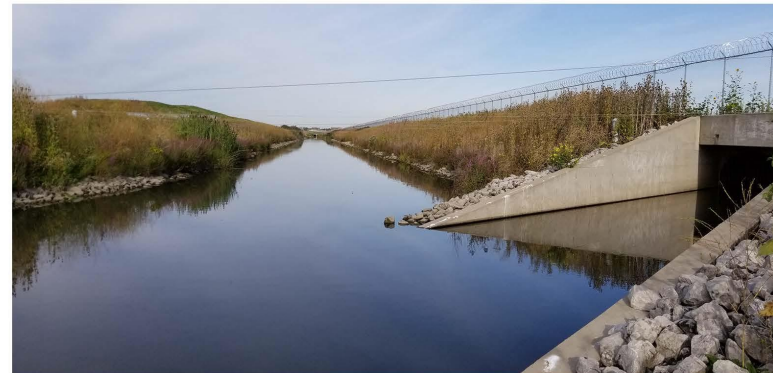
Bensenville Ditch - Section 2, General site, east end. View to the west
